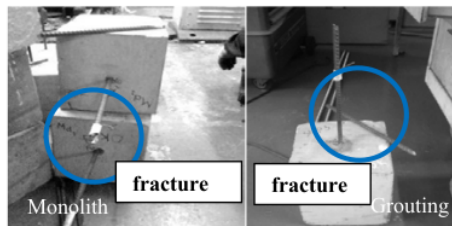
The failure pattern of experiment specimen with steel bar embedded into concrete 260 mm
